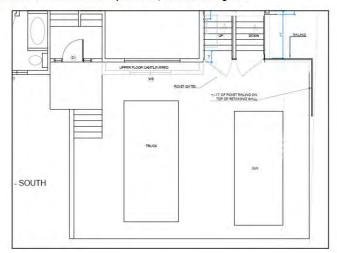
An arial view of the south of the residence with the footprint of the proposed driveway. Drawings provided by Momentum Design Build.
